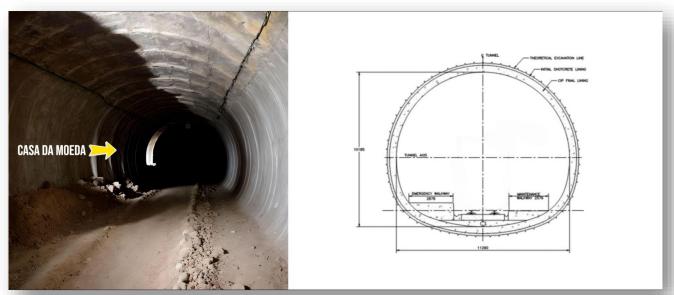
The found image containing a photograph of the tunnel and its architectural plans
